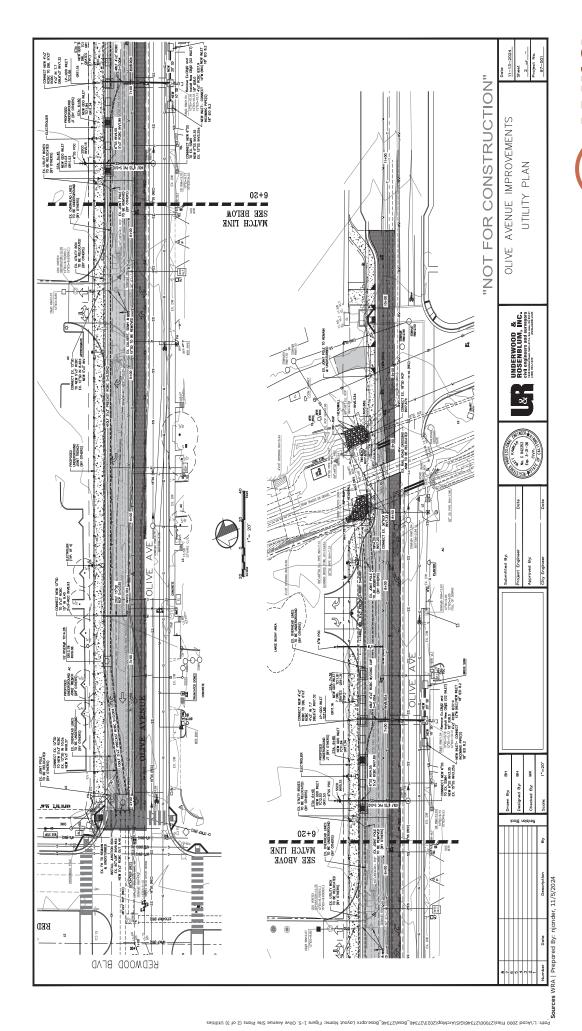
Olive Avenue Site Plans (2 of 3) Utilities
